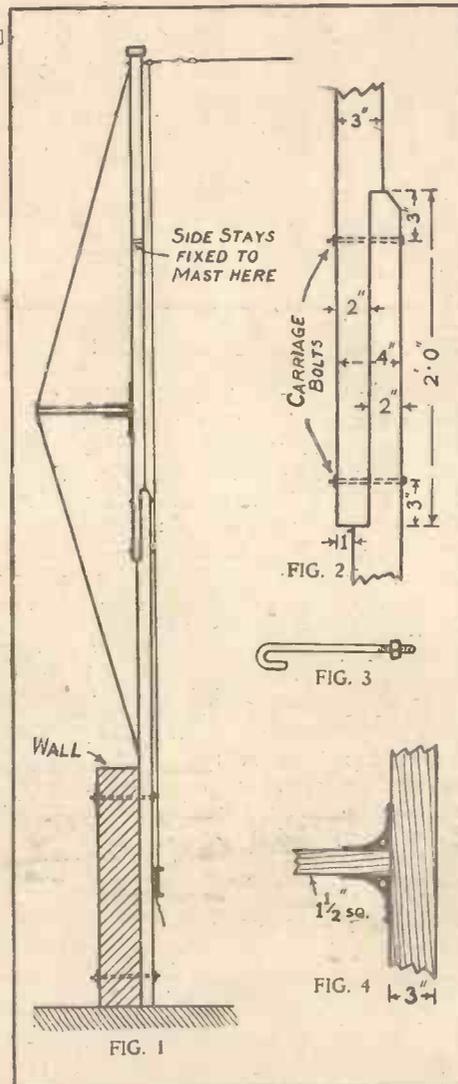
The Complete Mast. Fig. 2.—Details of Joint. Fig. 3.—Bolt for Securing Pulley. Fig. 4.—Method of Attaching Strut.
